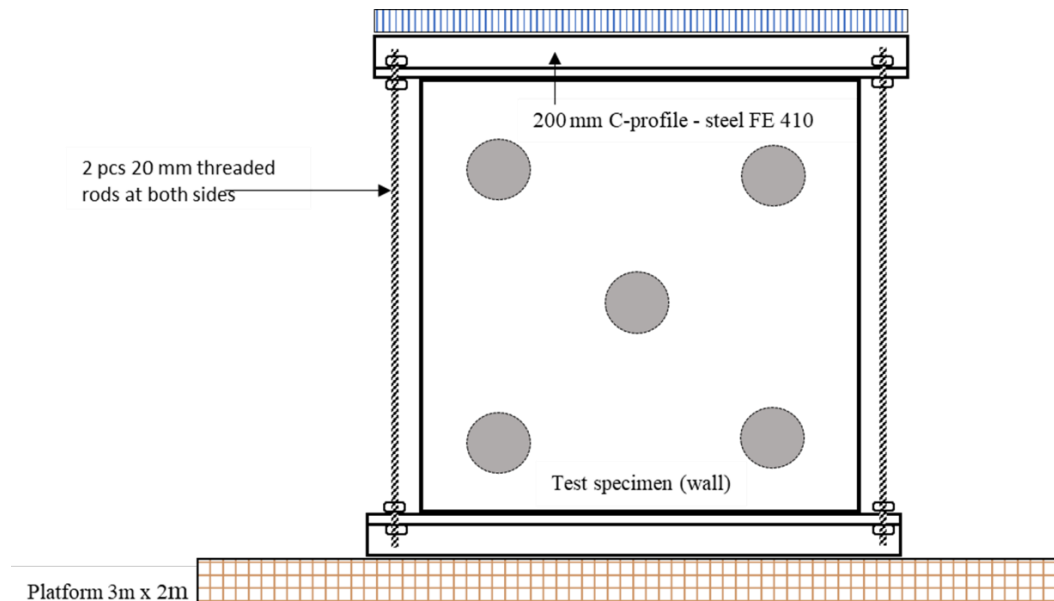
Test setup for tests of concrete wall elements in compression, with propane and hydrogen flame exposure.
